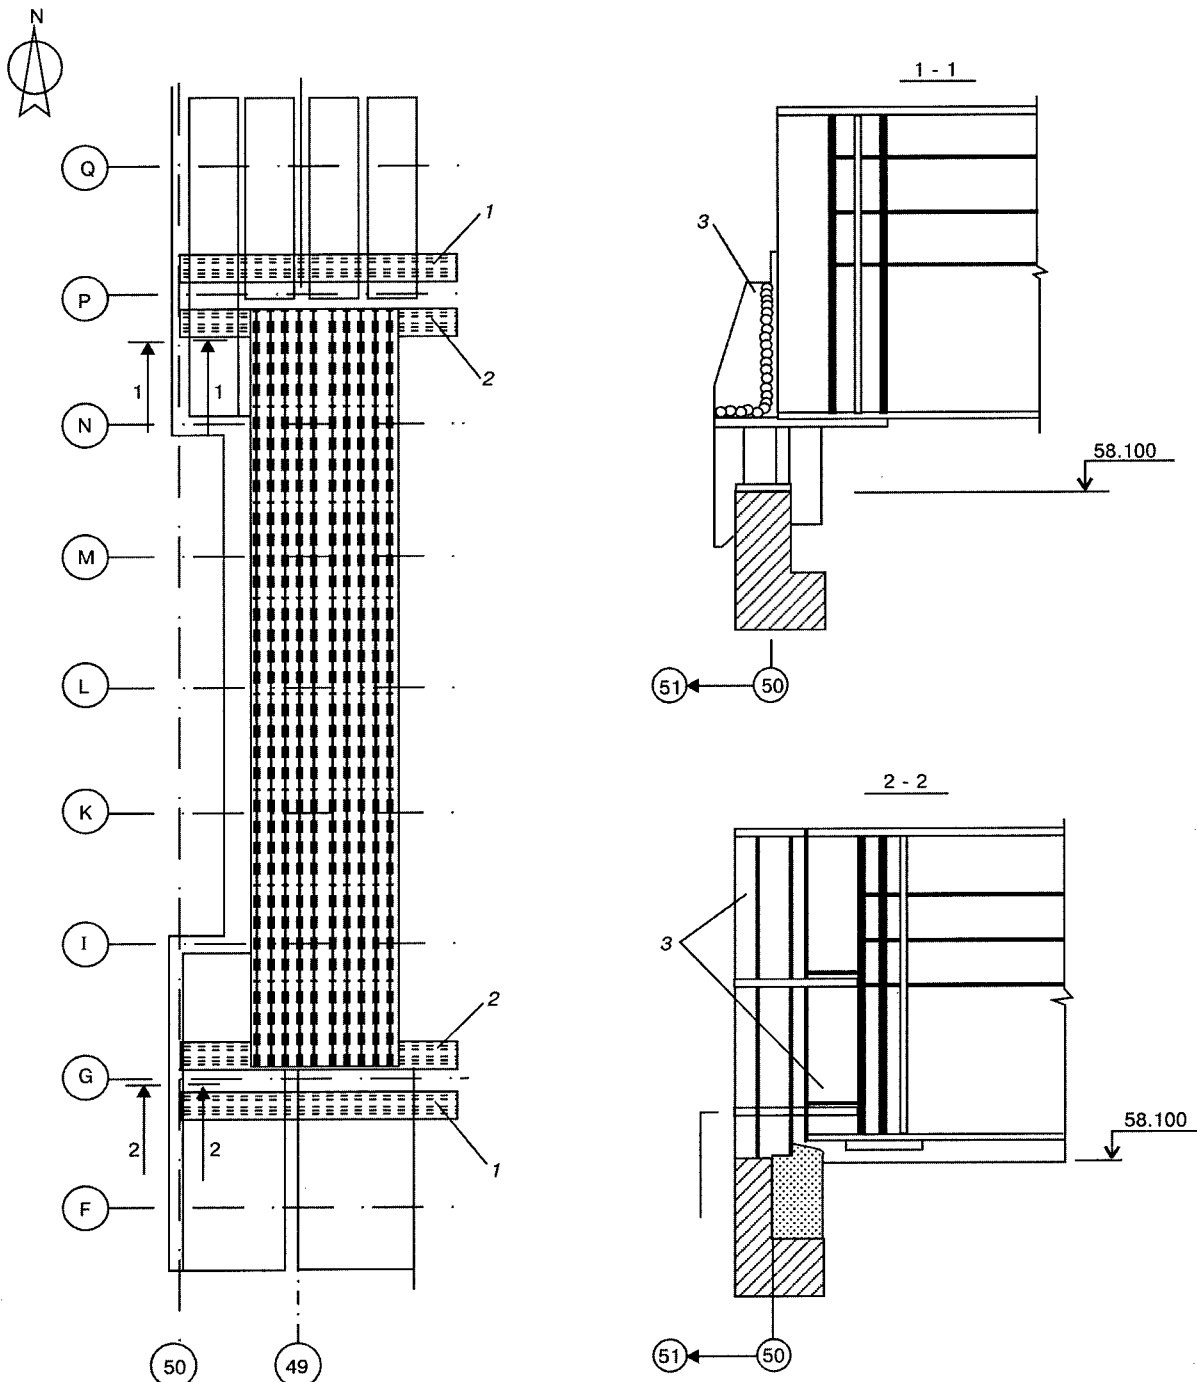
Reinforcement of supports of beams B1 and B2 along axes 50P and 50G: 1 — beam B1; 2 — beam B2; 3 — reinforcing member
